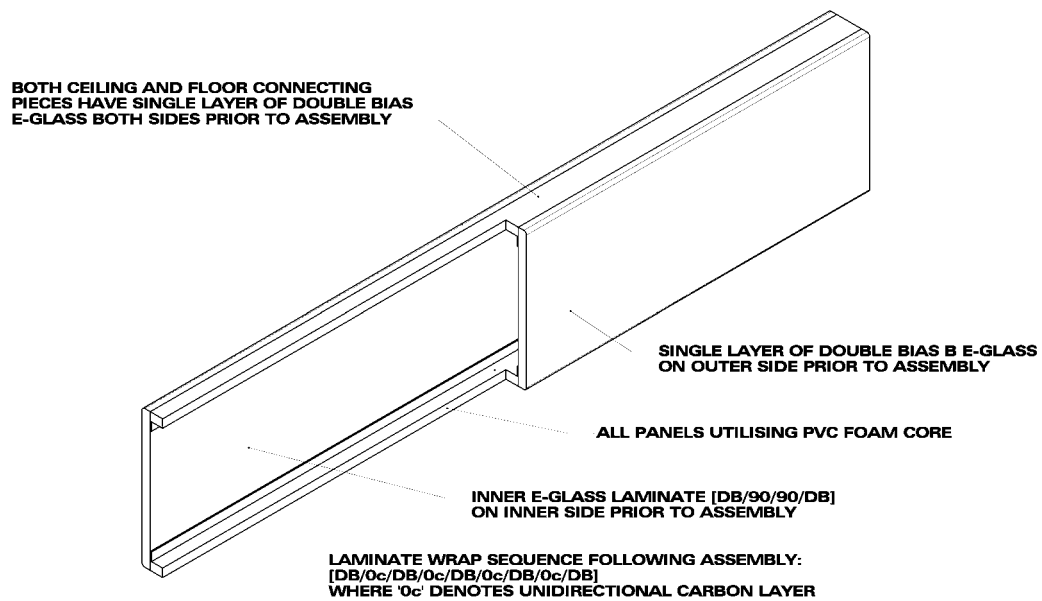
Configuration of Full-Scale Fatigue Beam
